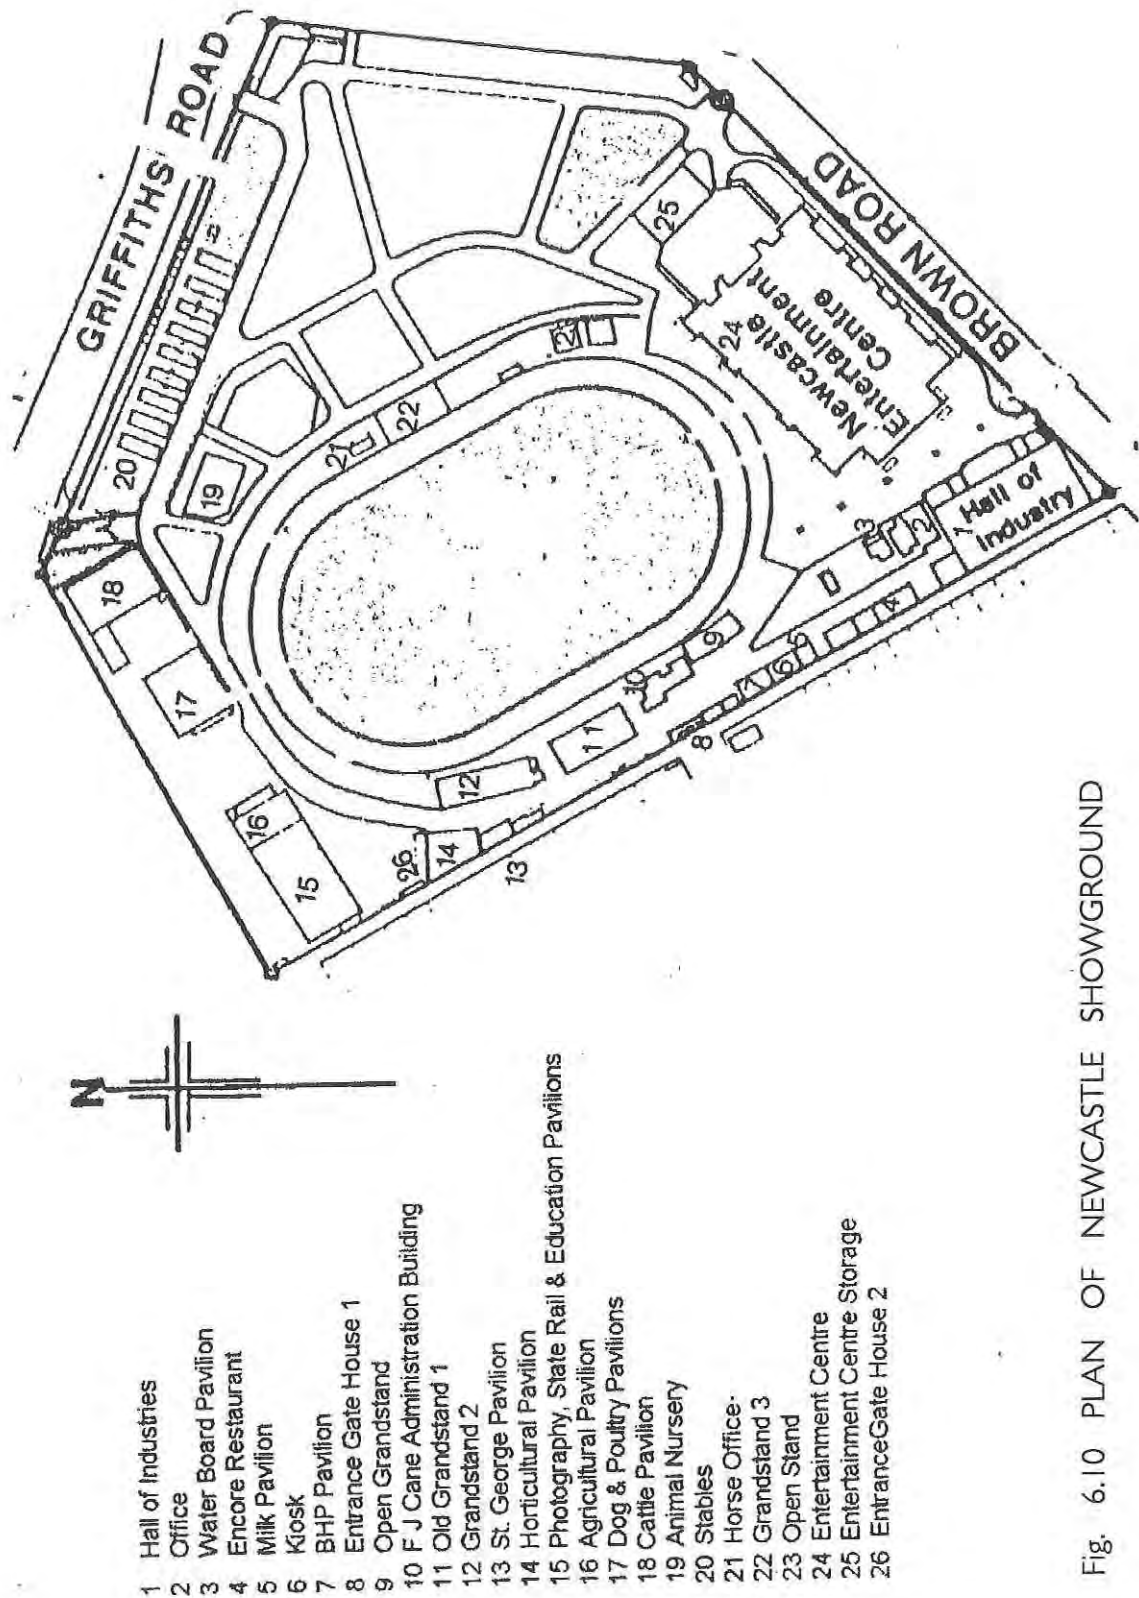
PLAN OF NEWCASTLE SHOWGROUND
